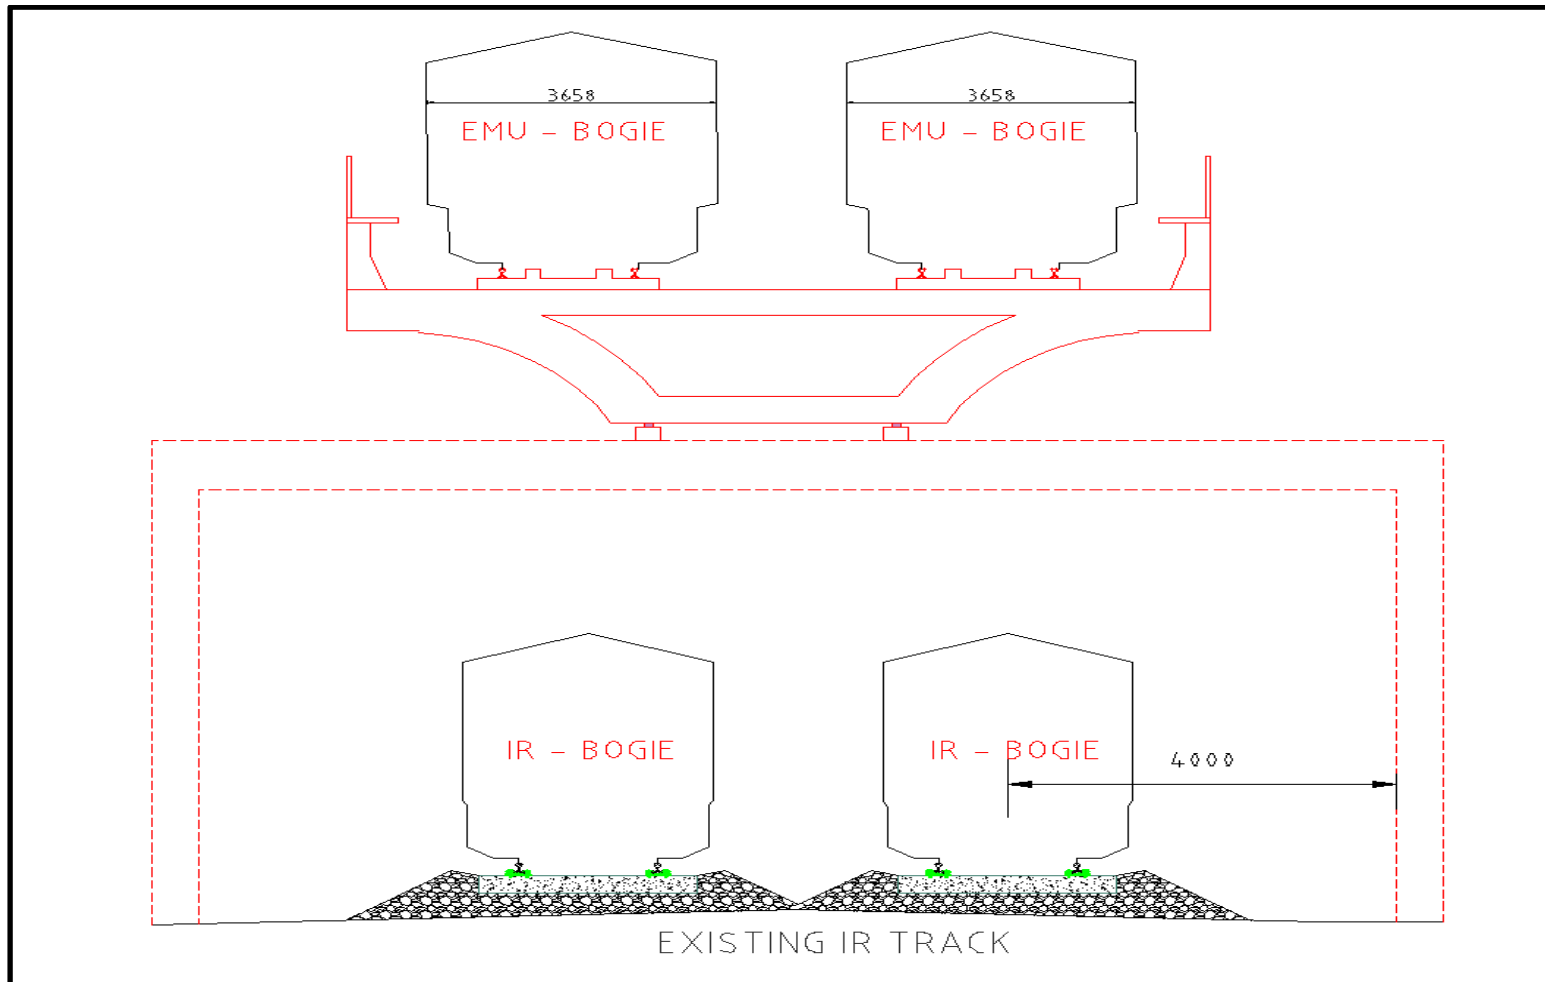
SECTION OF PORTAL ARRANGEMENT
